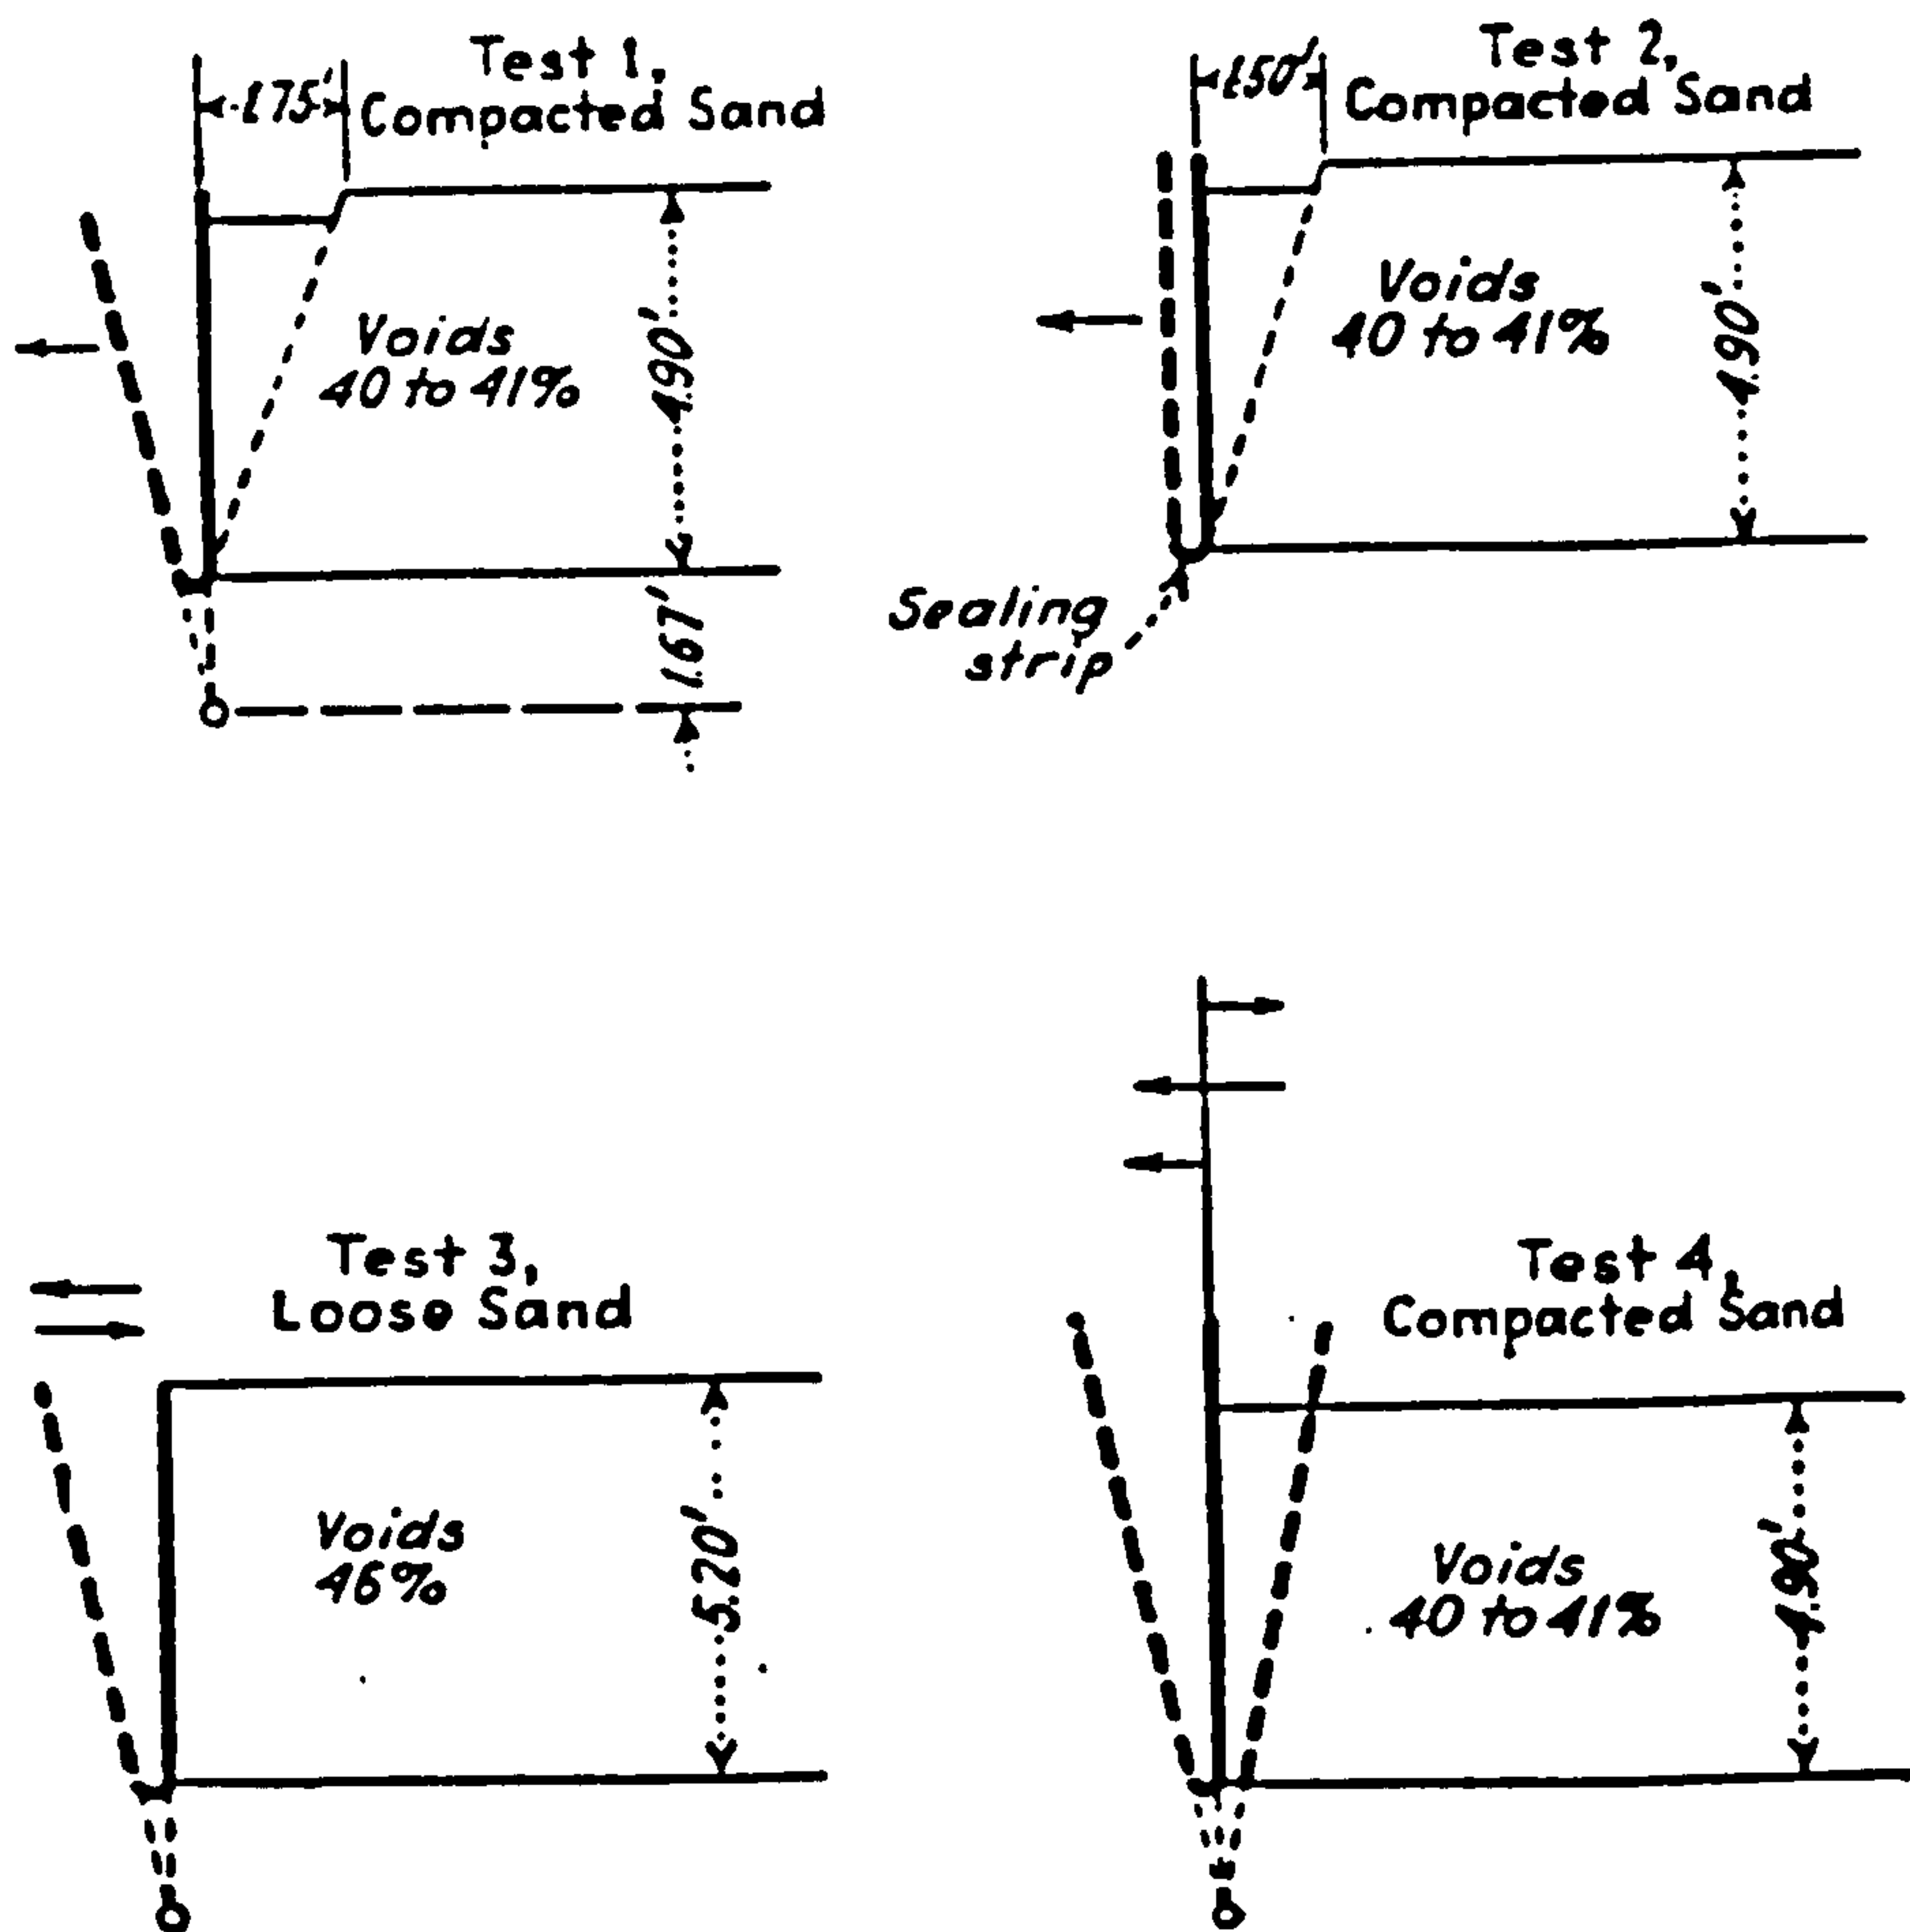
24) LARGE SCALE RETAINING WALL TEST (AFTER TERZAGHI, 1934).
